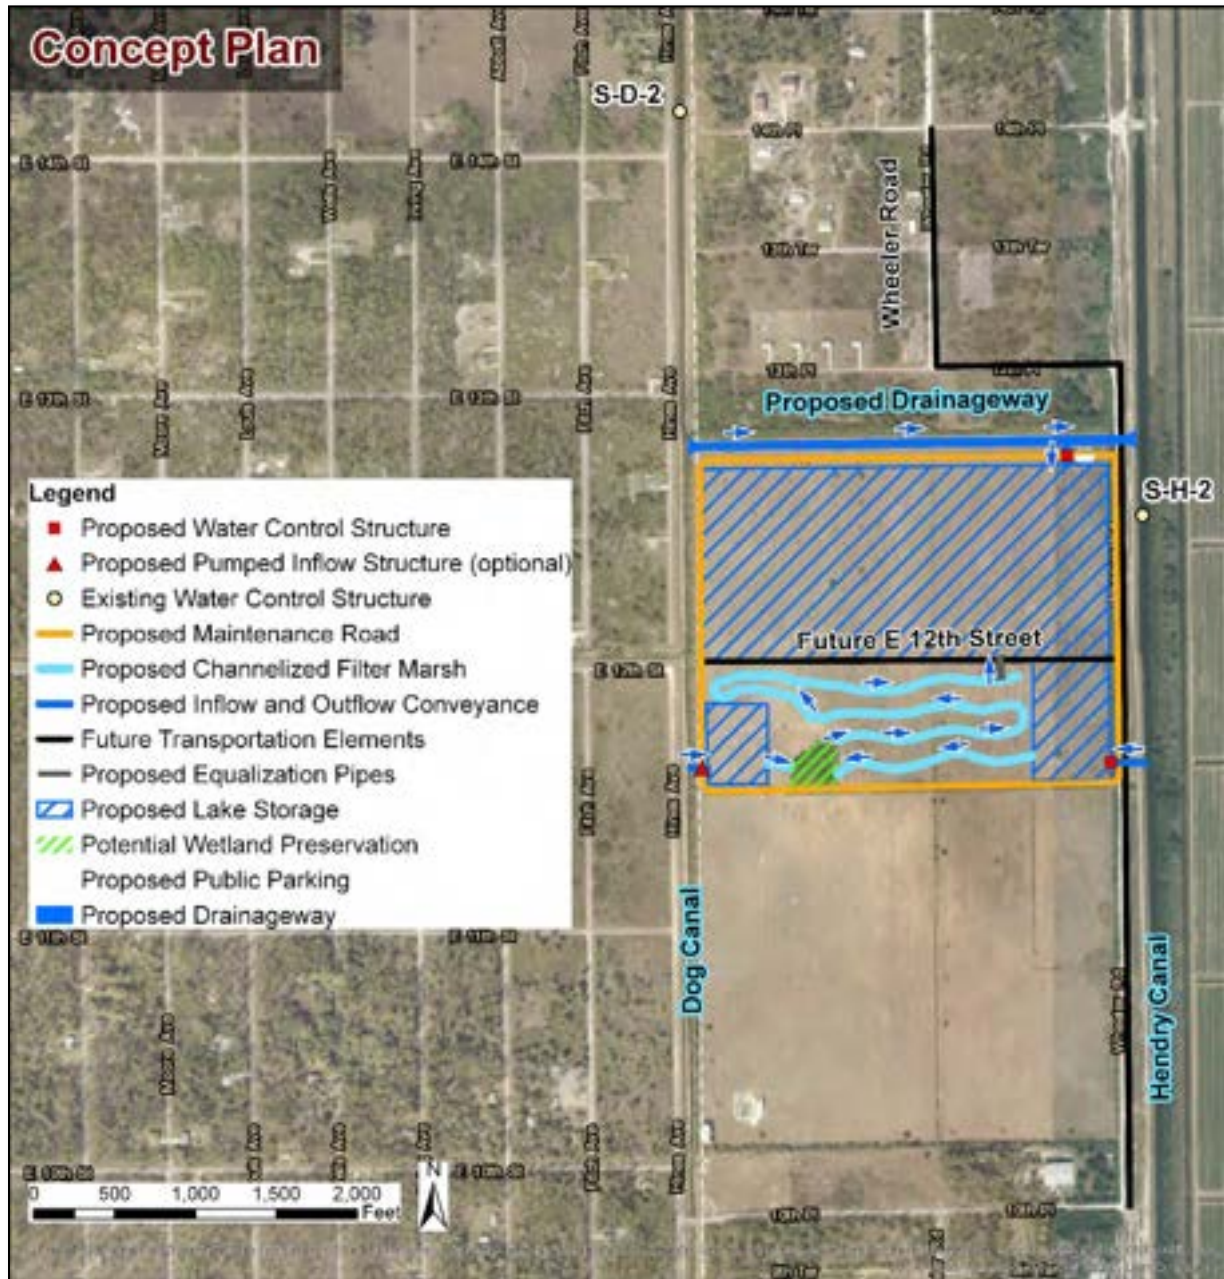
Concept Plan, 1.1.1 Dog to Hendry Drainageway (CREST)
